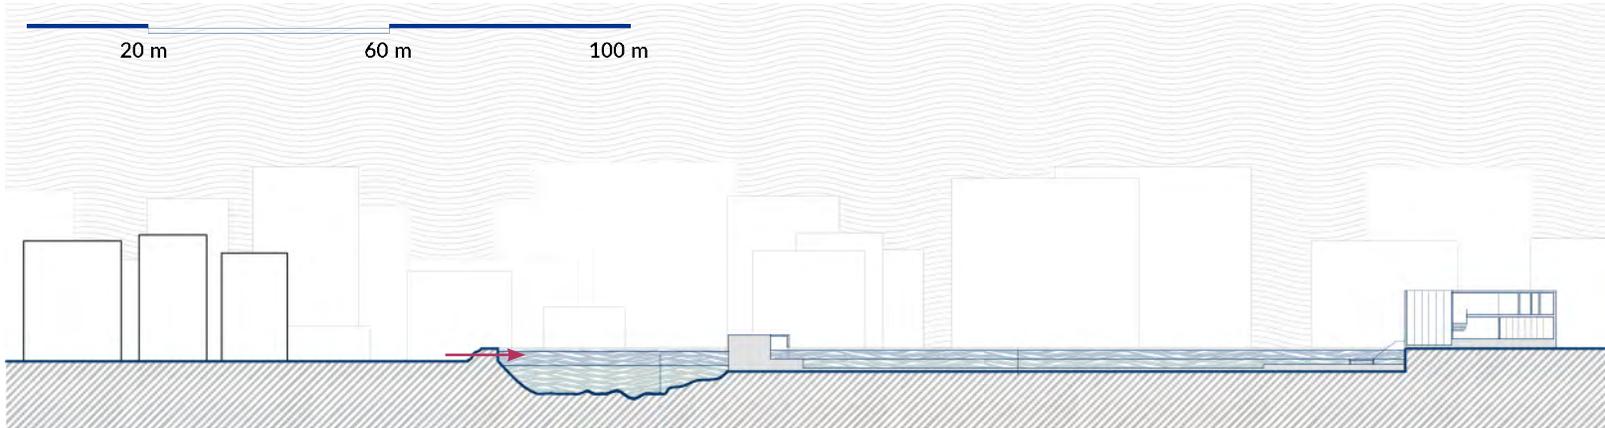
Site Section A during heavy rainfall. Refer to Figure 5.5 for section cut markers.
